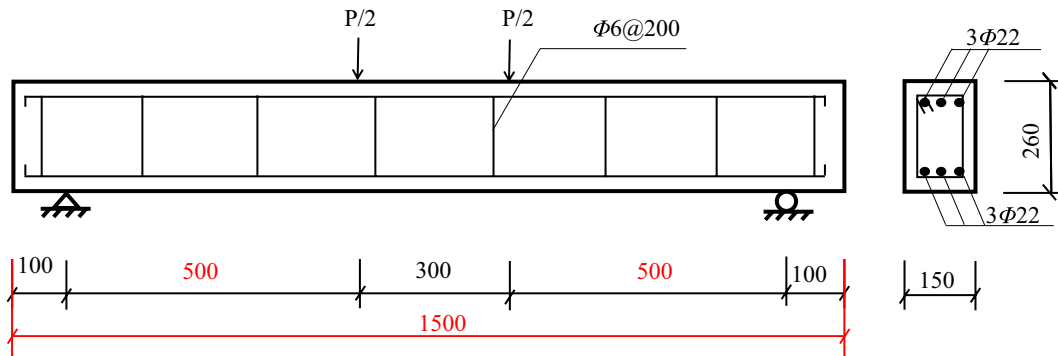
Dimension of beam and arrangement of reinforcement (unit: mm)
